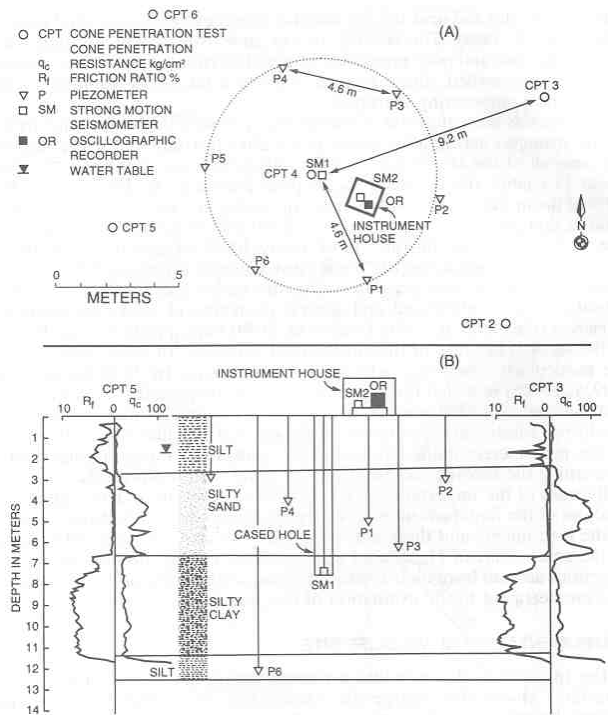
Site plan (a) and cross section (b) showing sediment layers and instrument locations at WLA (after Bennett et al., 1984)
